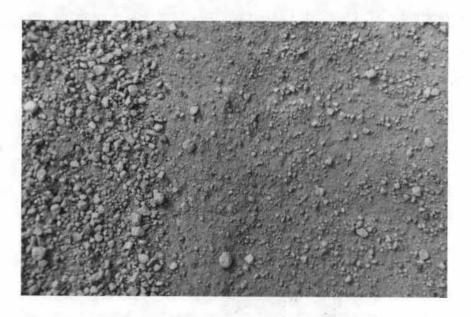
Close-up view prior to construction of 1% lignosulfonate plus 0.5% lime additive section, 1970, Clinton test road.
